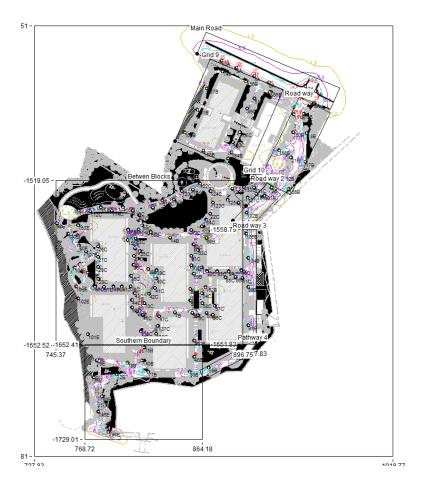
Illumination Levels (Lux) for Barrington (Lighting Reality)
